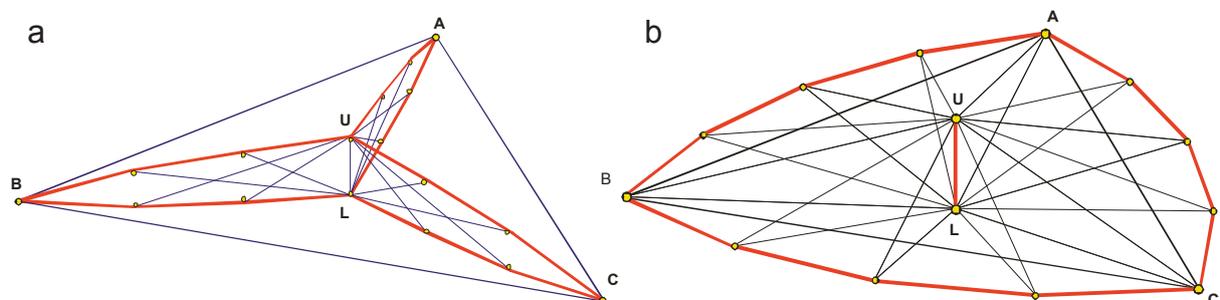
a) Spatial form of new type of lenticular girder called system MT, b) another form of this girder called system D
